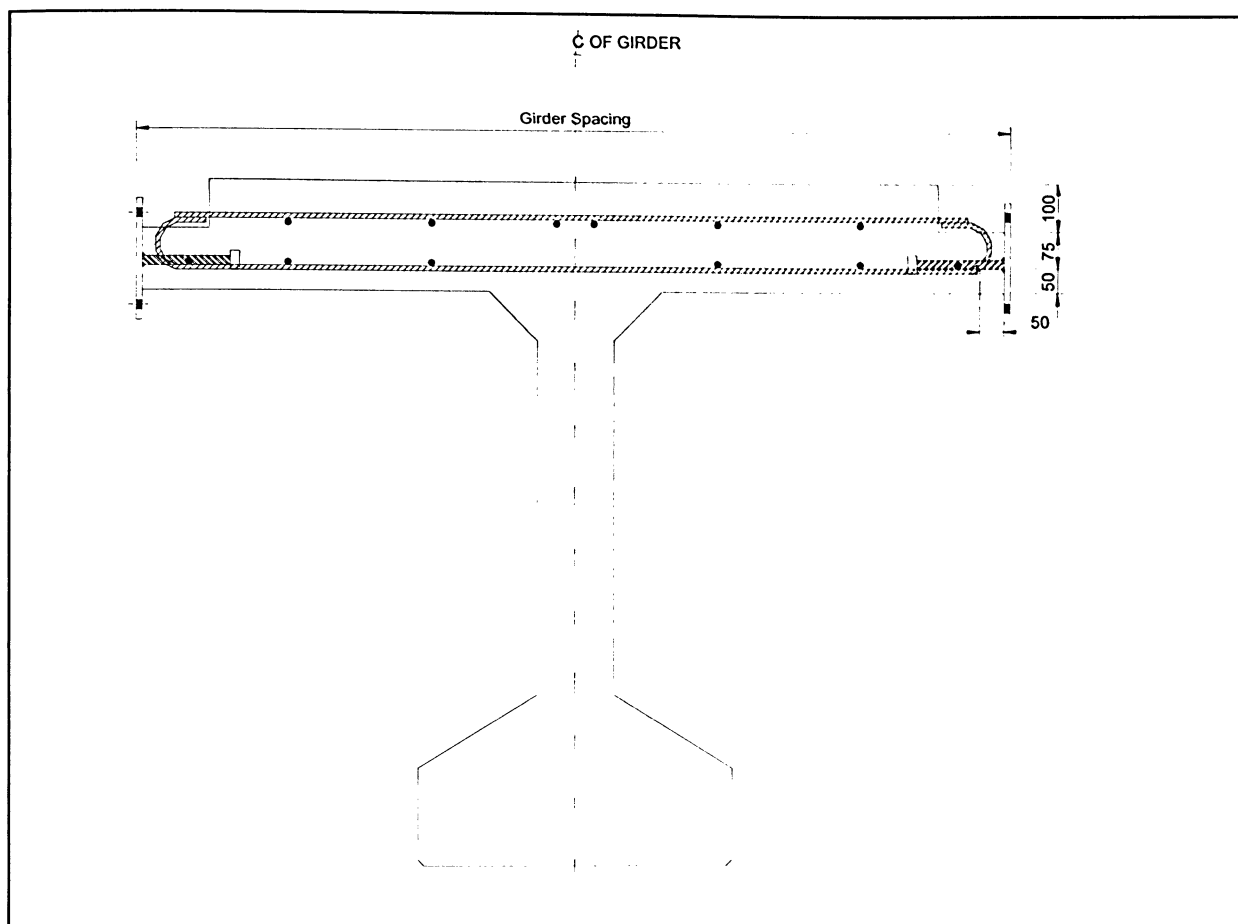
Cross-Section of the IBC-1 girder Connection with Structural Details
